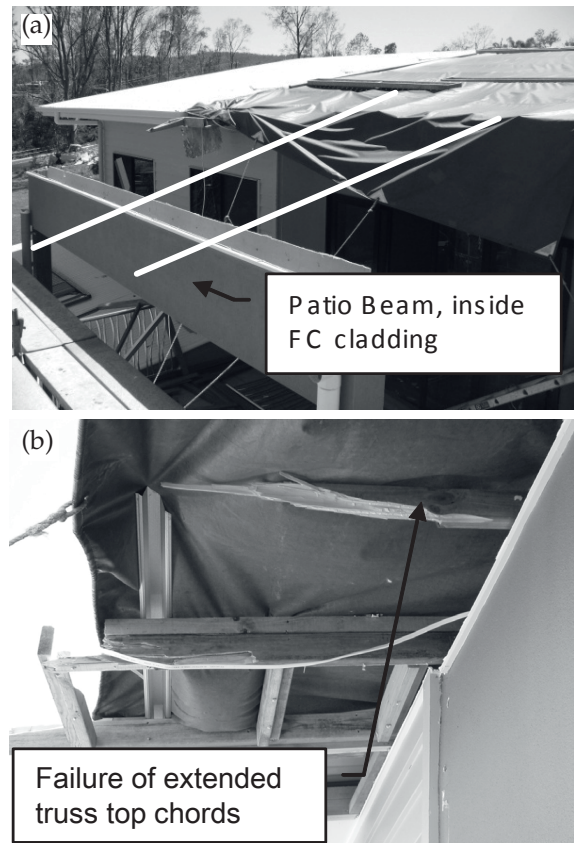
Failed patio roof structure – (a) general view showing extent of the loss of the patio roof; and (b) view from underneath patio roof showing failed truss tails.
